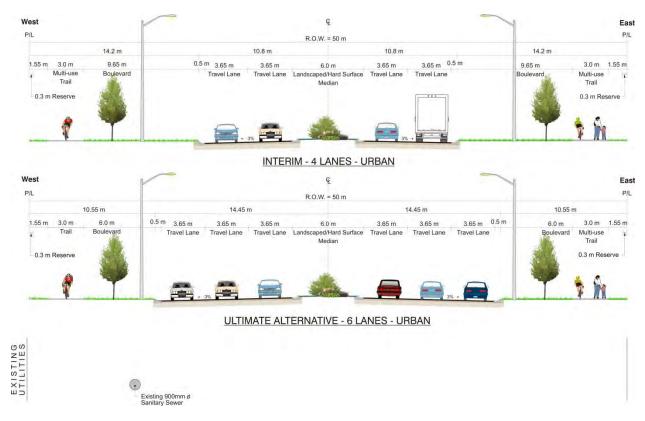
TYPICAL CROSS-SECTION LAUZON PARKWAY COUNTY ROAD 42 TO HIGHWAY 401
